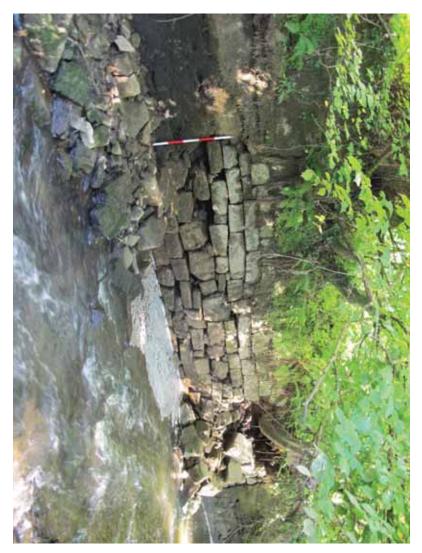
View of CHS 17, revetment wall, taken from northwest.
